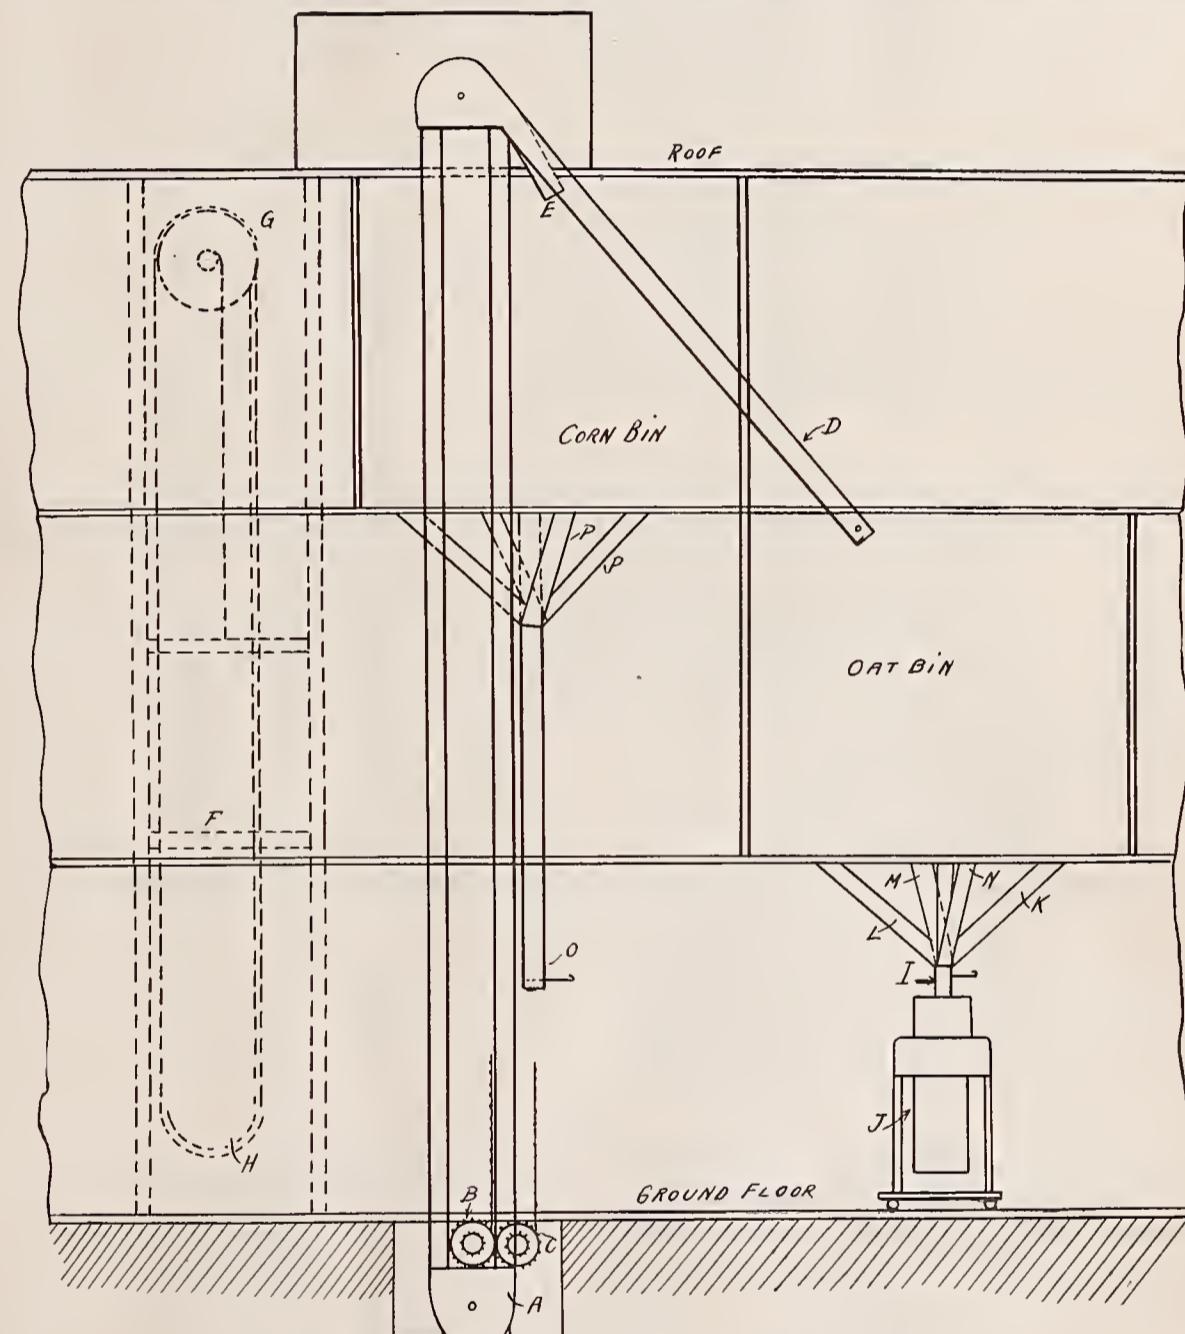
ARRANGEMENT OF ELEVATORS, BINS AND SCALE
